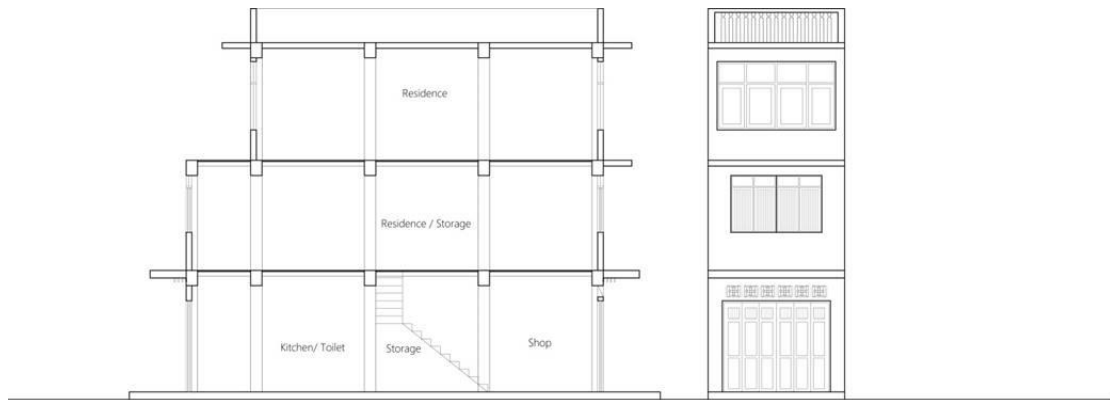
37 Type 04: 2 floor concrete shophouses on Soi Praturuk Nokyang
